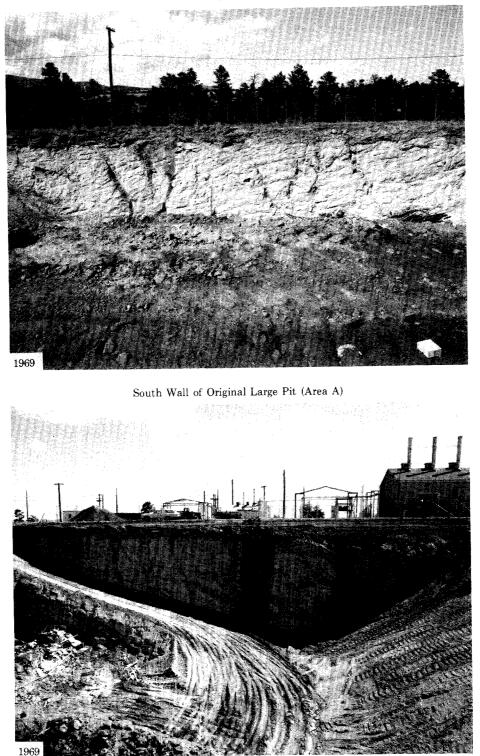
North and south walls of original large pit at Area A showing soil zone, tuff and joints, first layer of waste, and access road.
